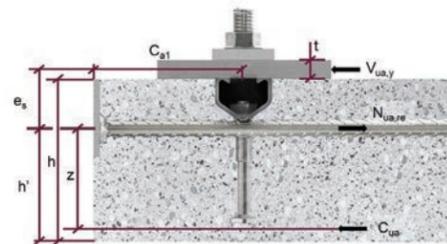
Anchor reinforcement to resist shear loads.
